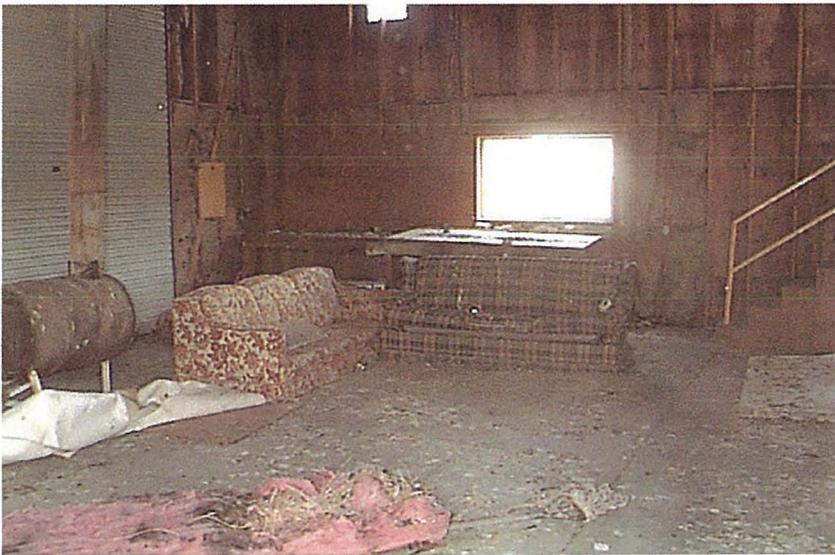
Taken by E. Seum on 4/18/00. Shows interior of building shown in photos 31 & 32.
